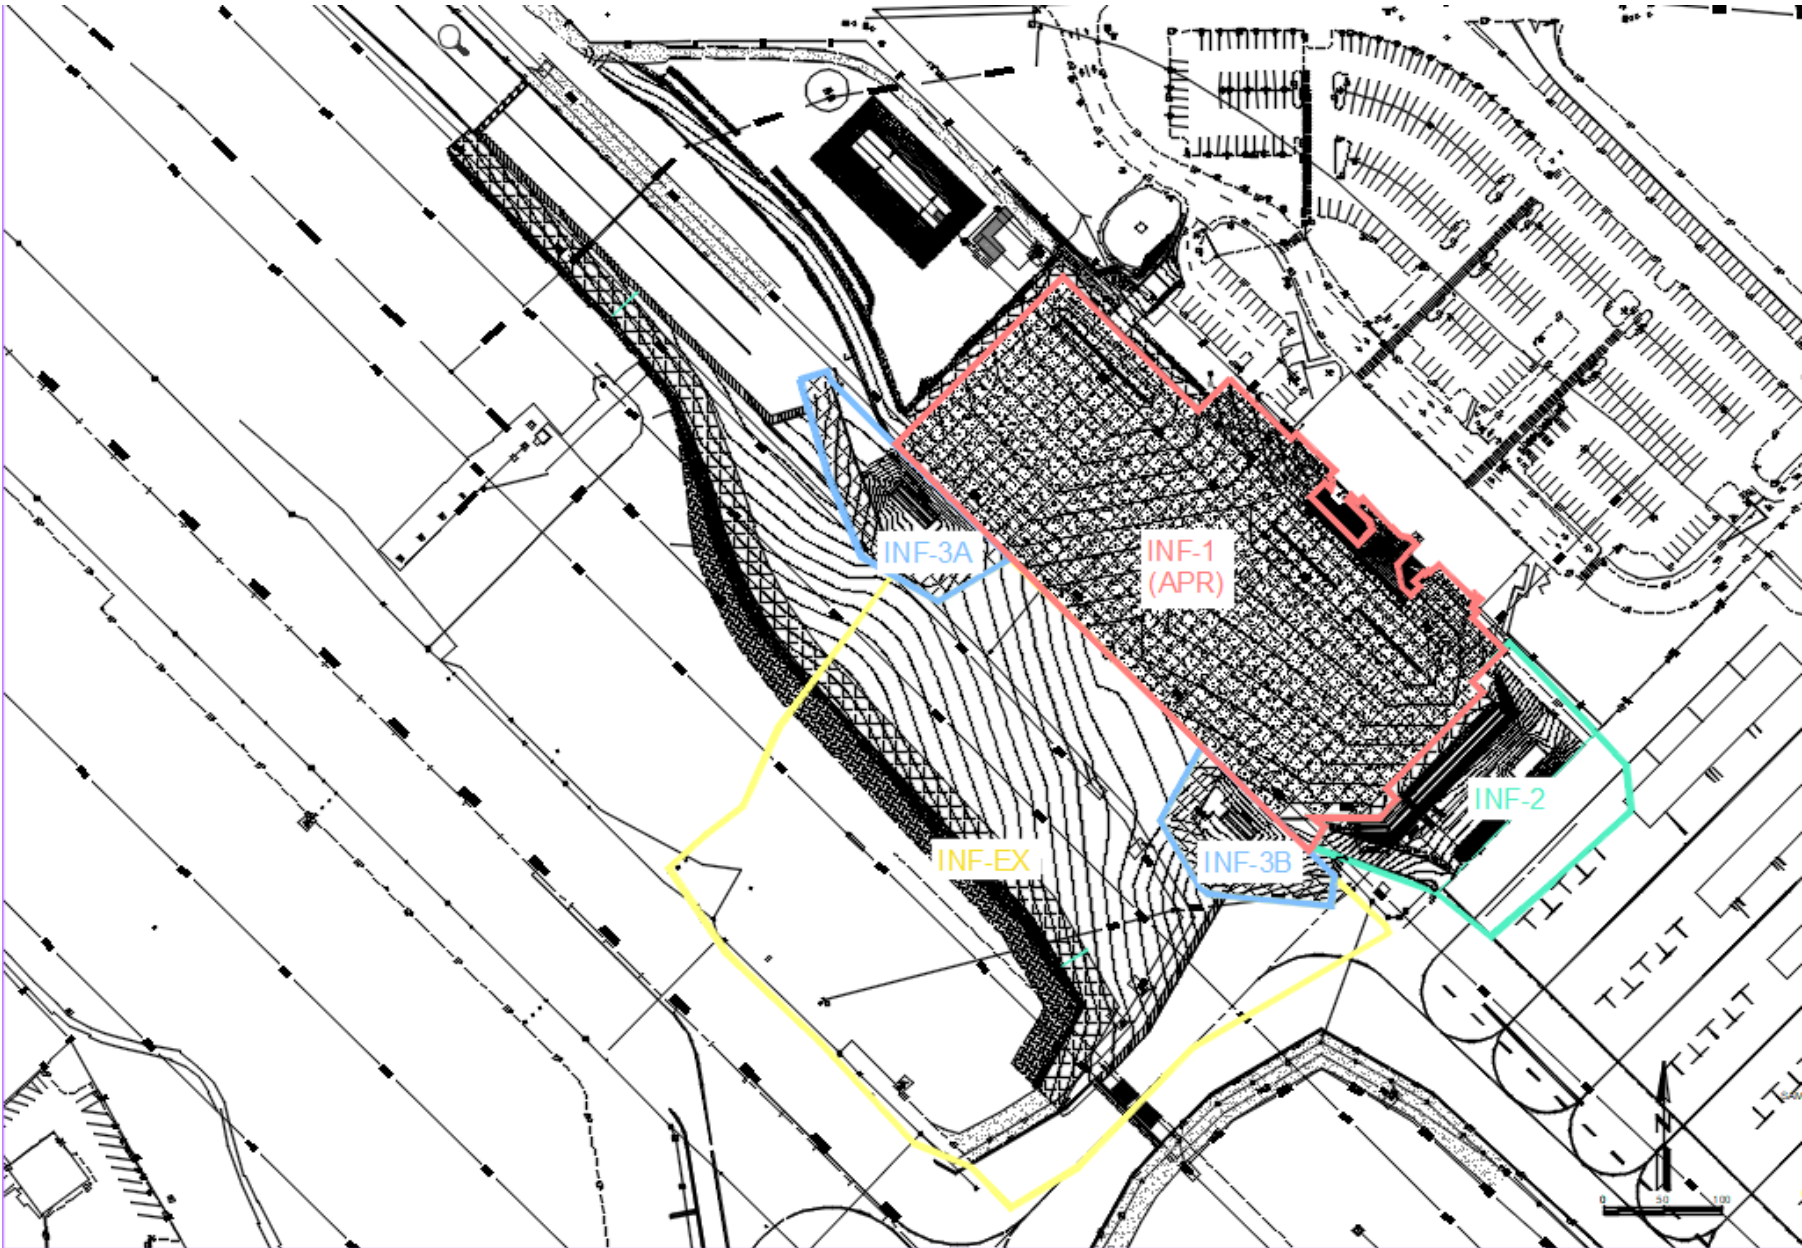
Proposed Infiltration Trench Drainage Areas
